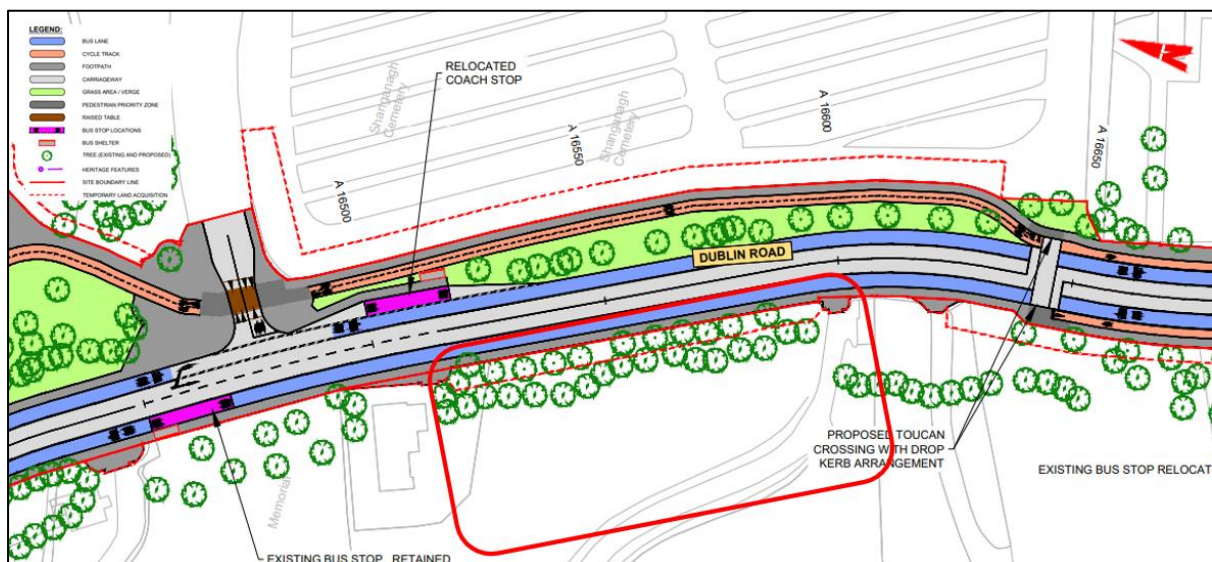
Extract from General Arrangement Drawing at Askefield House on Dublin Road (Sheet 47)
